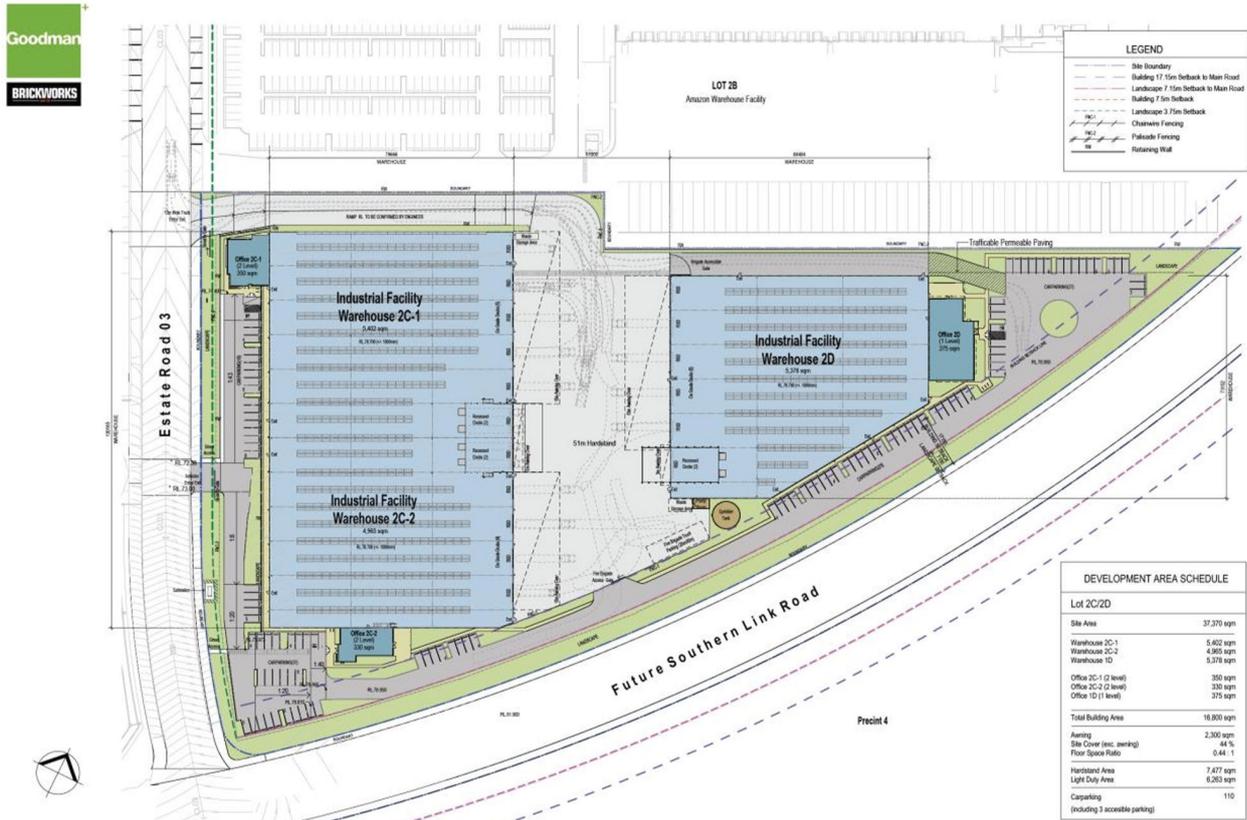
Oakdale West Estate, 2C-1, 2C-2 and 2D Site and Warehouse Plan
